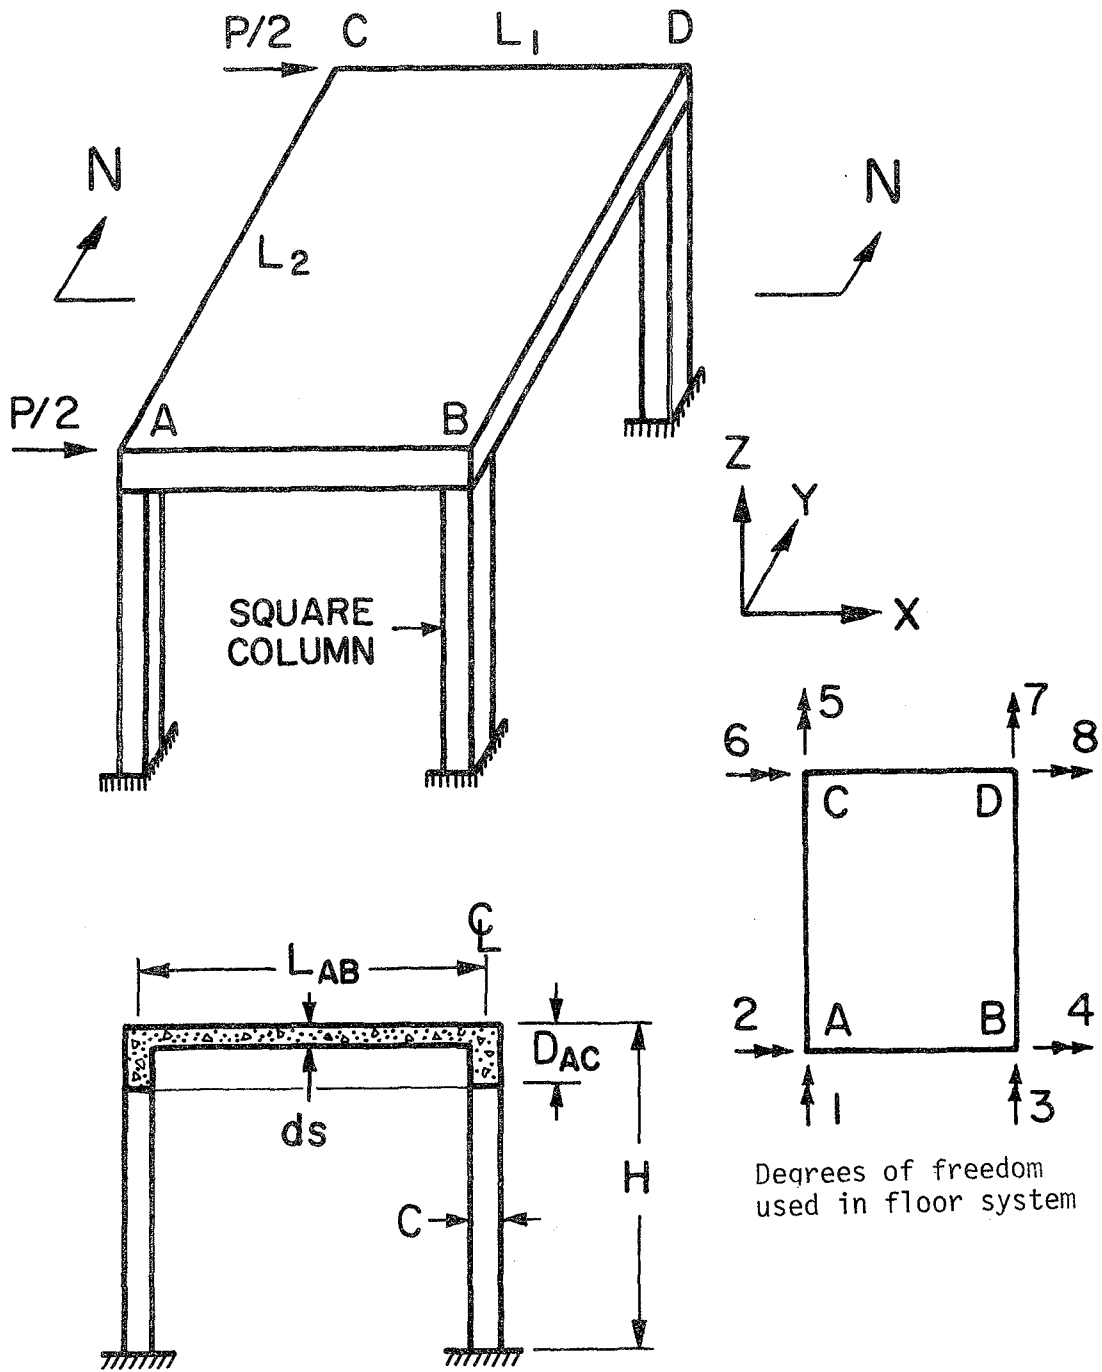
Single-Panel, Single-Story Structure under Lateral Loading
